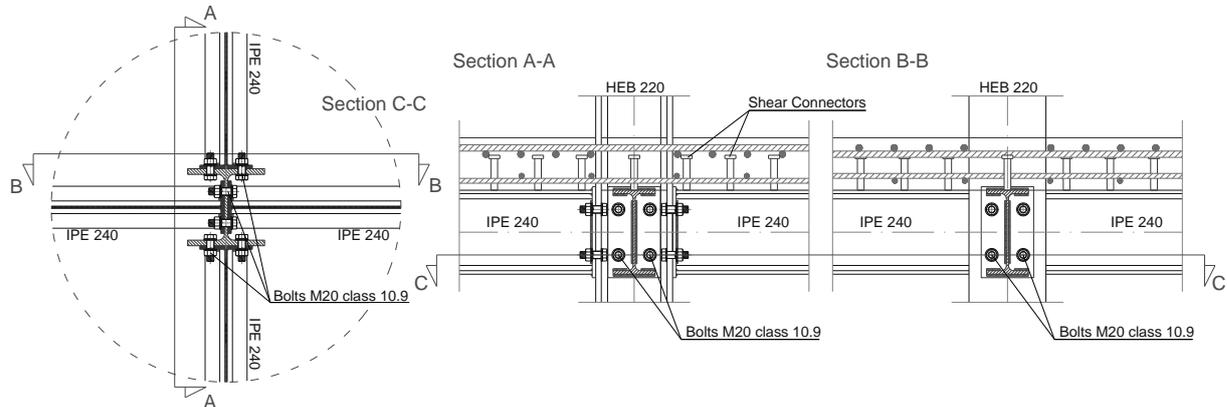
Beam-Column Interior Joint with Flush-End Plate Connection
